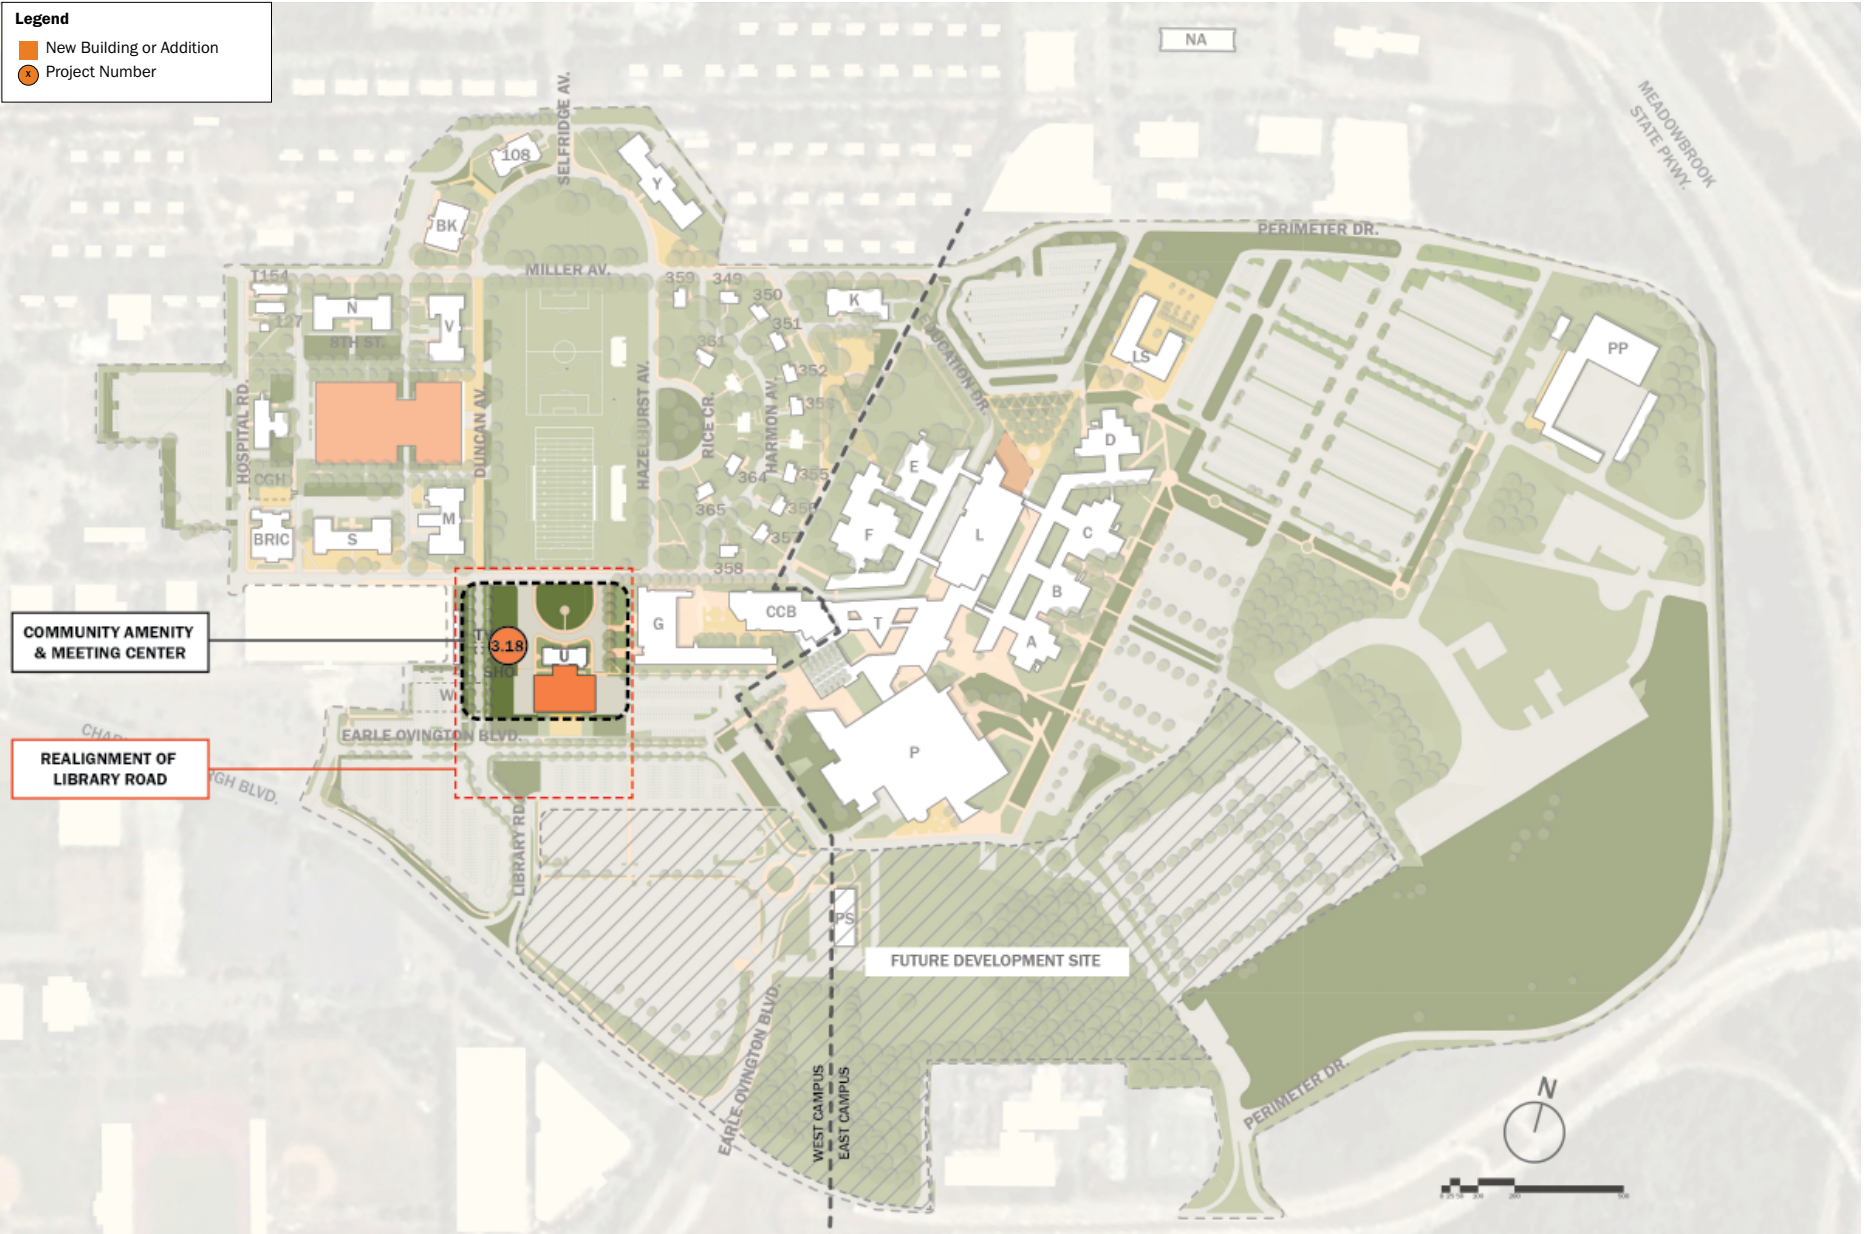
Site plan identifying the new community amenity & meeting center at Union Building
